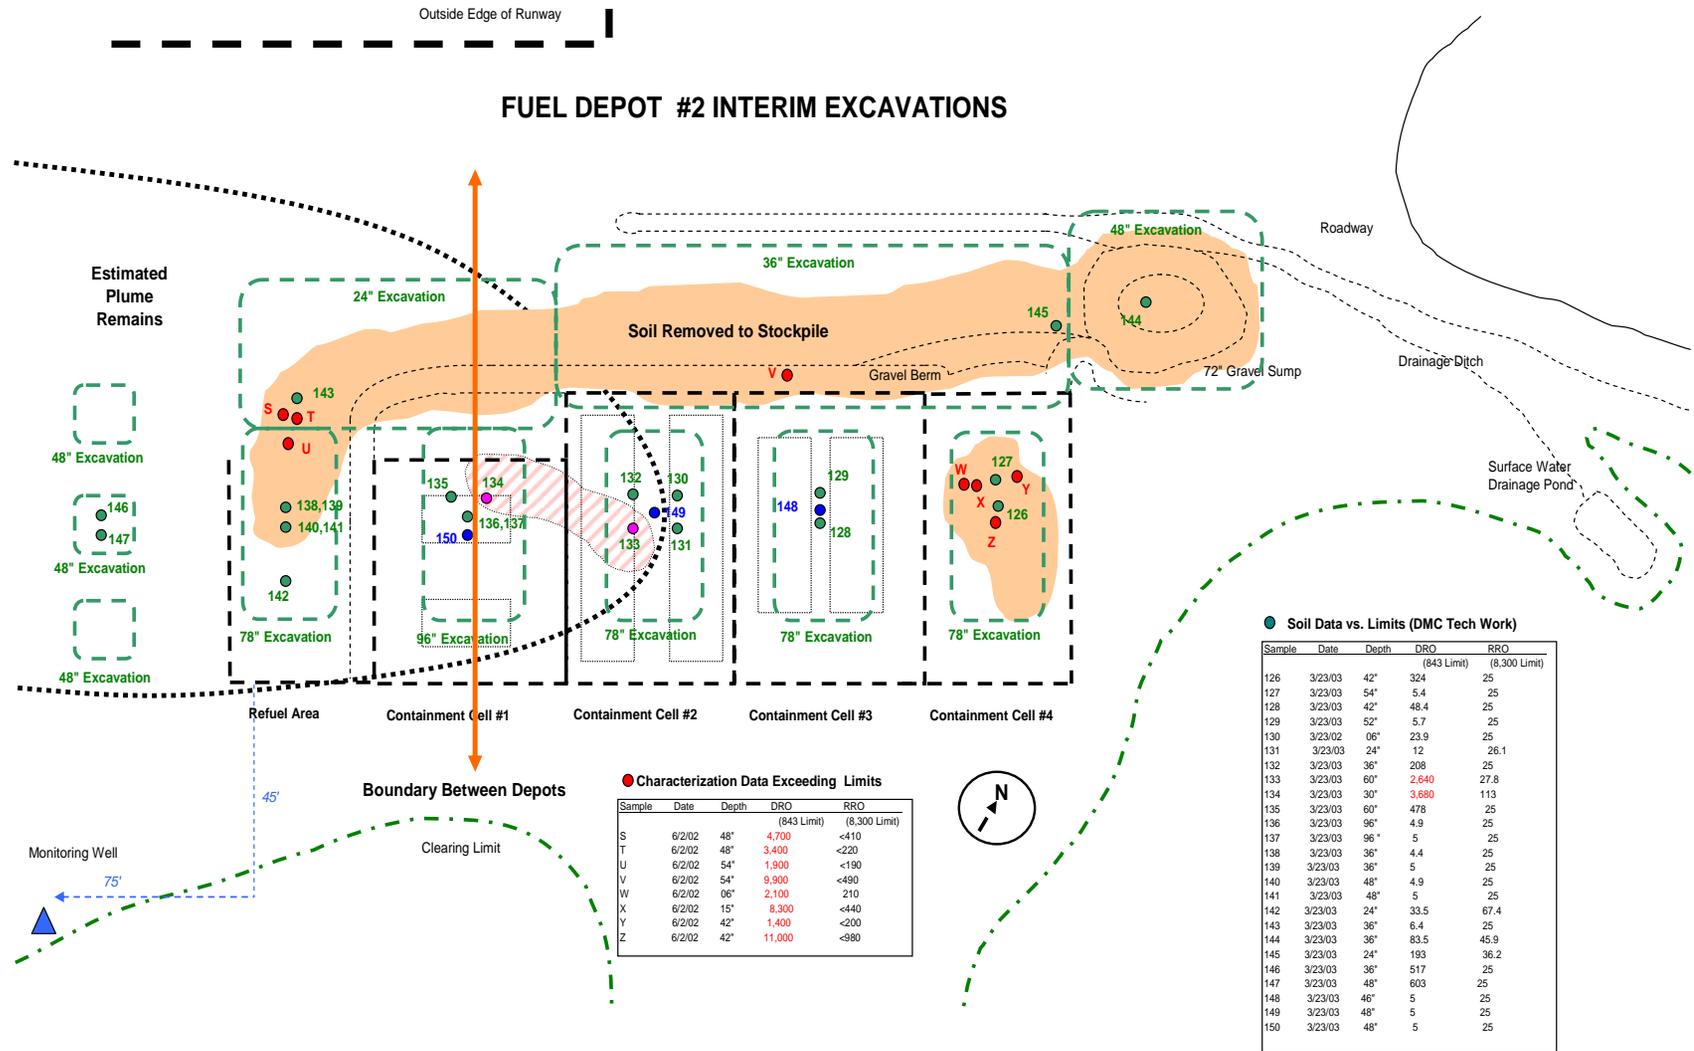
Fuel Depot #2 Layout - Interim Excavations
